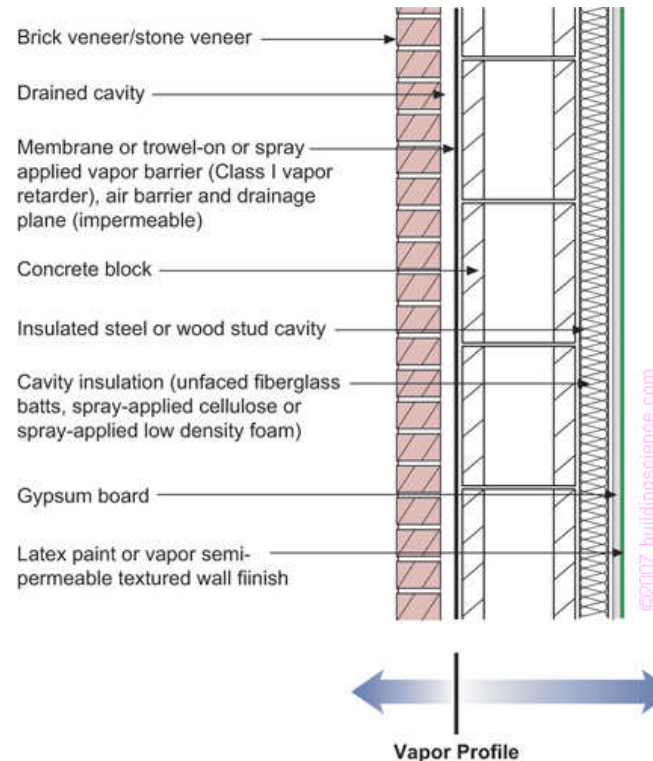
Concrete Block With Interior Frame Wall Cavity Insulation and Brick or Stone Veneer
